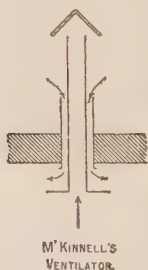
A roof provided with this ventilator, showing inlet and outlet shafts.
